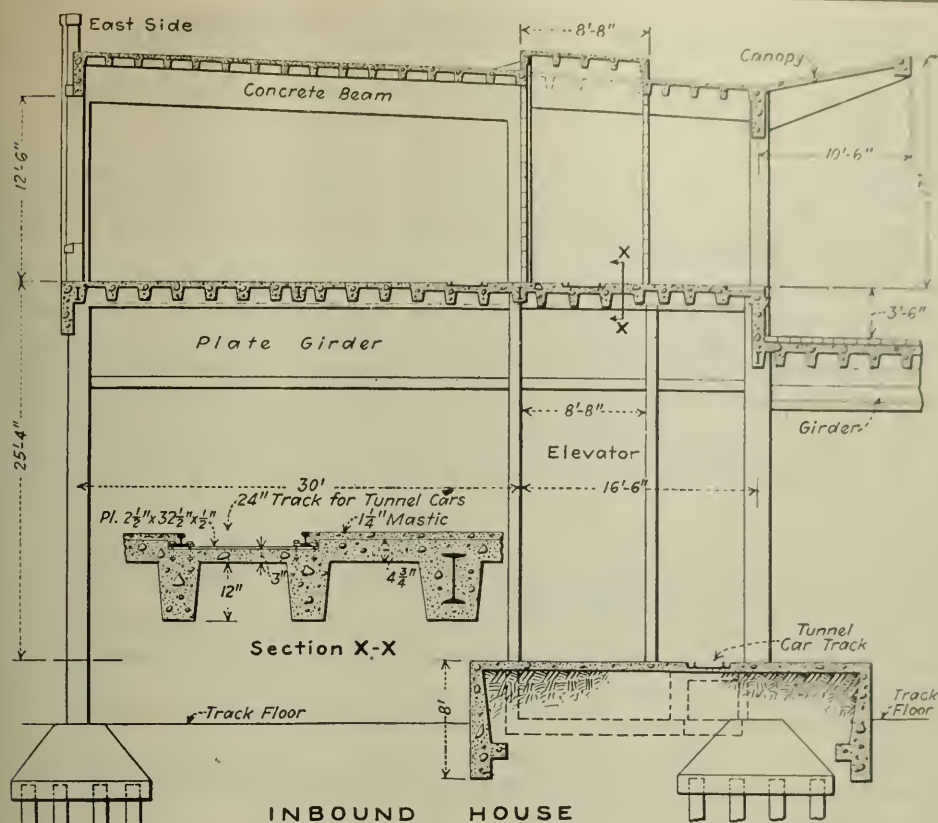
COMBINED STEEL AND CONCRETE CONSTRUCTION OF FREIGHT HOUSE
